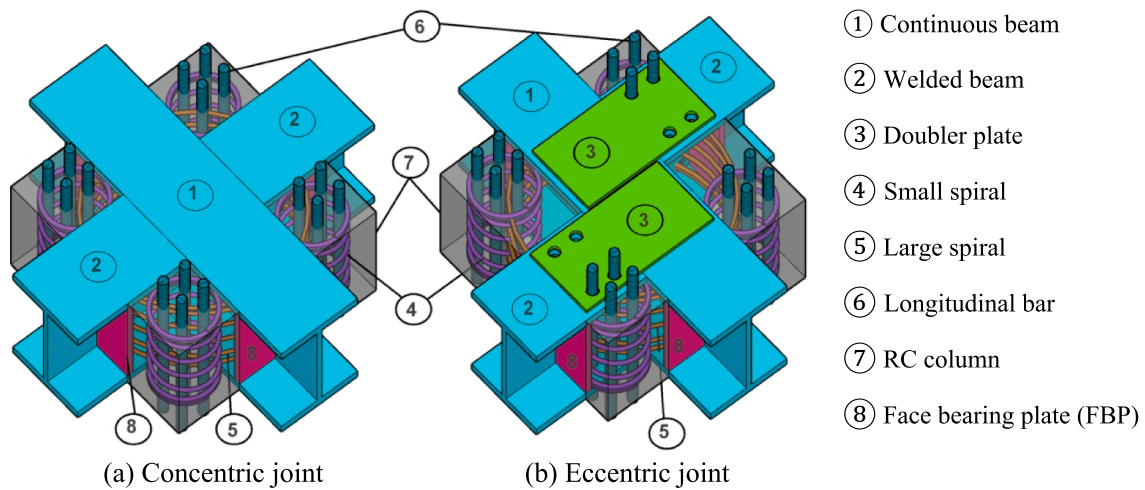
Proposed joint design details: (a) concentric joint, and (b) eccentric joint.
